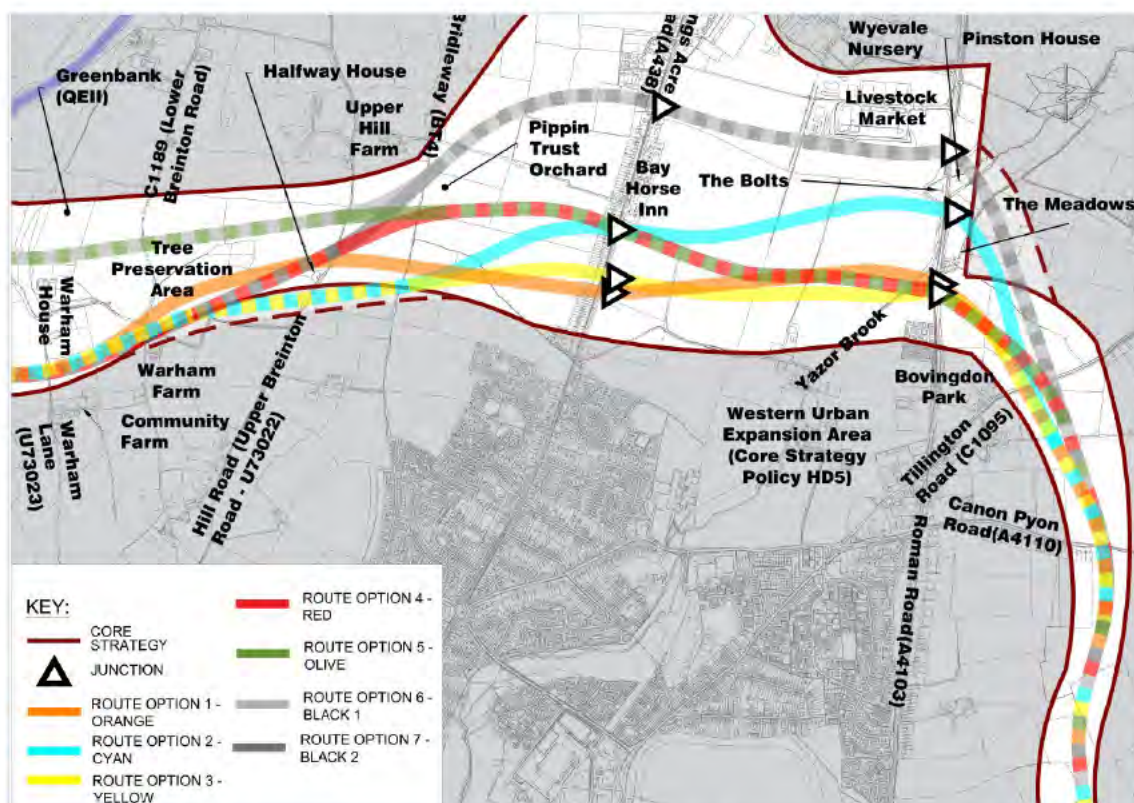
Element 2: Hill Road (Upper Breinton Road – U73022) to Canon Pyon Road
